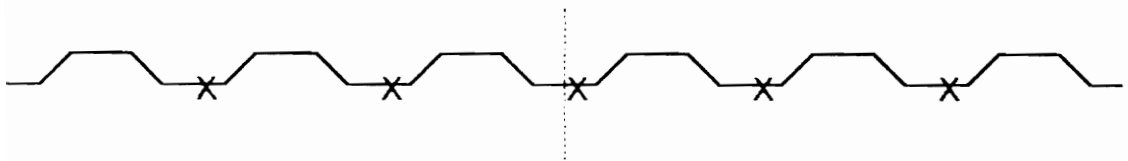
SDI-3/20-5-10 Concrete Strain Gage and Shear Stud Locations
